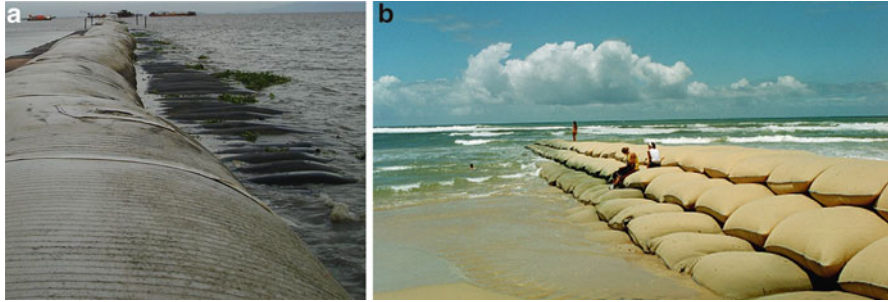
Examples of applications of (a) geotextile tubes for coastal protection (After Lee 2009) and (b) geotextile bags as breakwater (After Saathoff et al. 2007)
